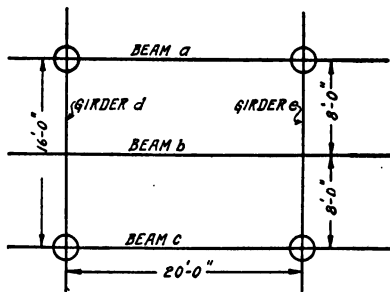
Skeleton Outline of Floor Panel Showing Slab, Beam, and Girder Construction
